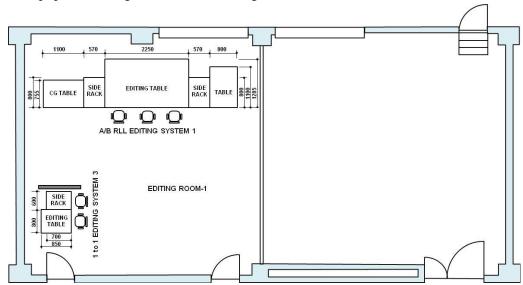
Equipment Arrangement of Editing Room-1
